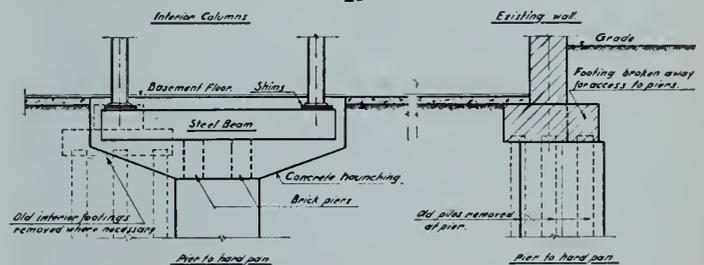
Sectional view showing the arrangement of the piers between the interior columns.
